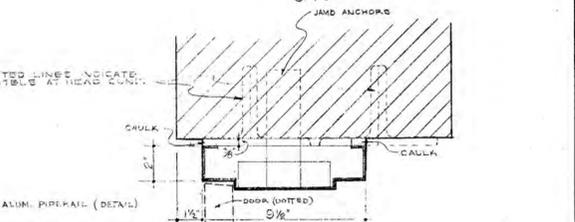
DETAIL SECTIONS - ALUM. ENTRANCE CANOPY
